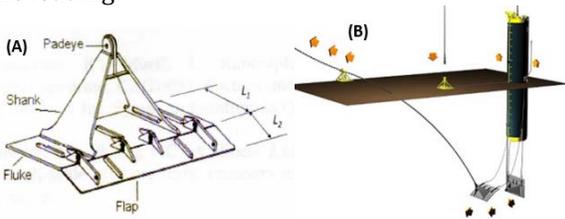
(A) SEPLA CONFIGURATION [10]; (B) SEPLA CONCEPT - SUCTION INSTALLATIONS, CAISSON RETRIEVAL, ANCHOR KEYING, & THE MOBILIZED ANCHOR [11].
